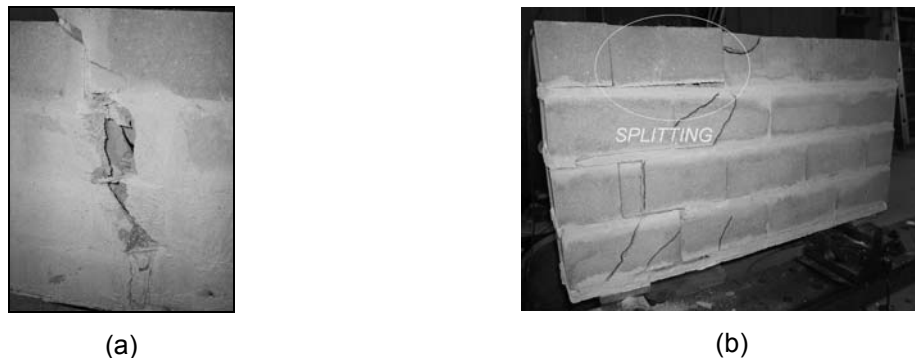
Damage states on the masonry beams: (a) thick localized shear crack and dowel action effect of the horizontal reinforcements through diagonal crack (S-2C-S2) and (b) splitting of blocks at the upper course (S-3C-SH).
